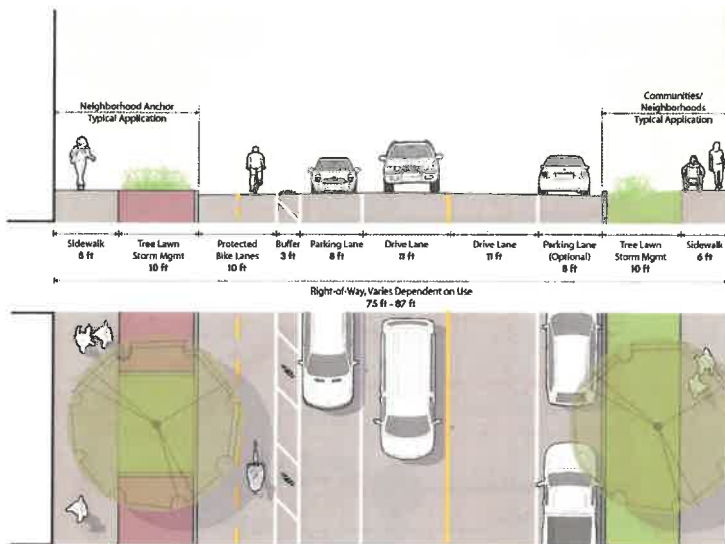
Neighborhood Avenue Typical Cross Section.
